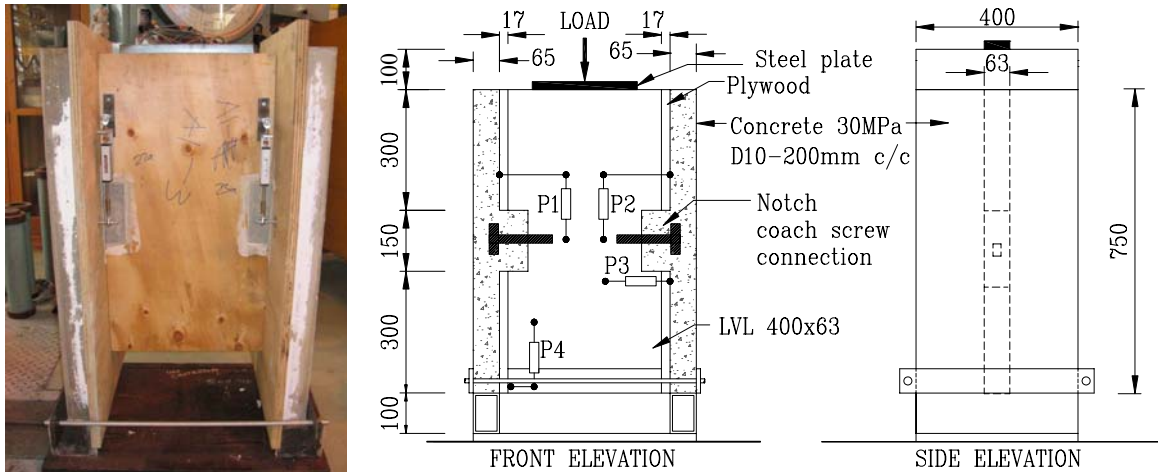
Symmetrical push-out test set-up (dimensions in mm)
